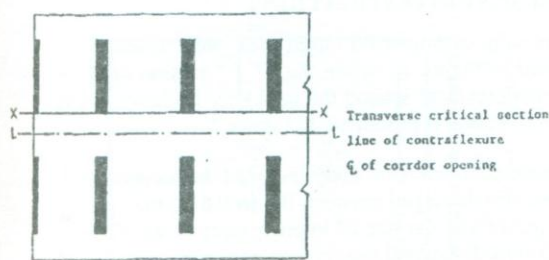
Plan of a typical Shear Wall building showing transverse critical section
